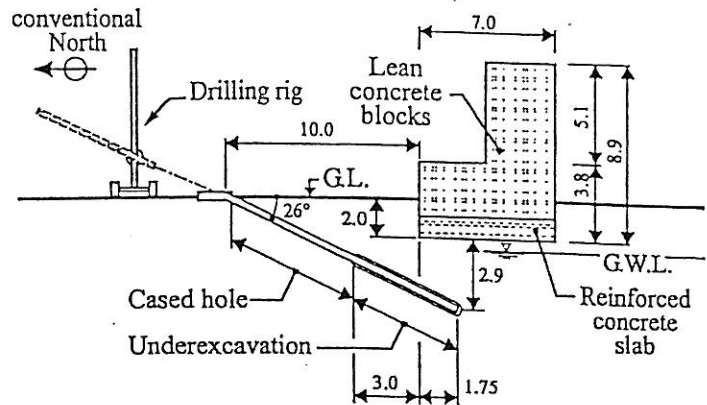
Underexcavation for correcting inclination of Pisa Tower (Terracina 1962)
